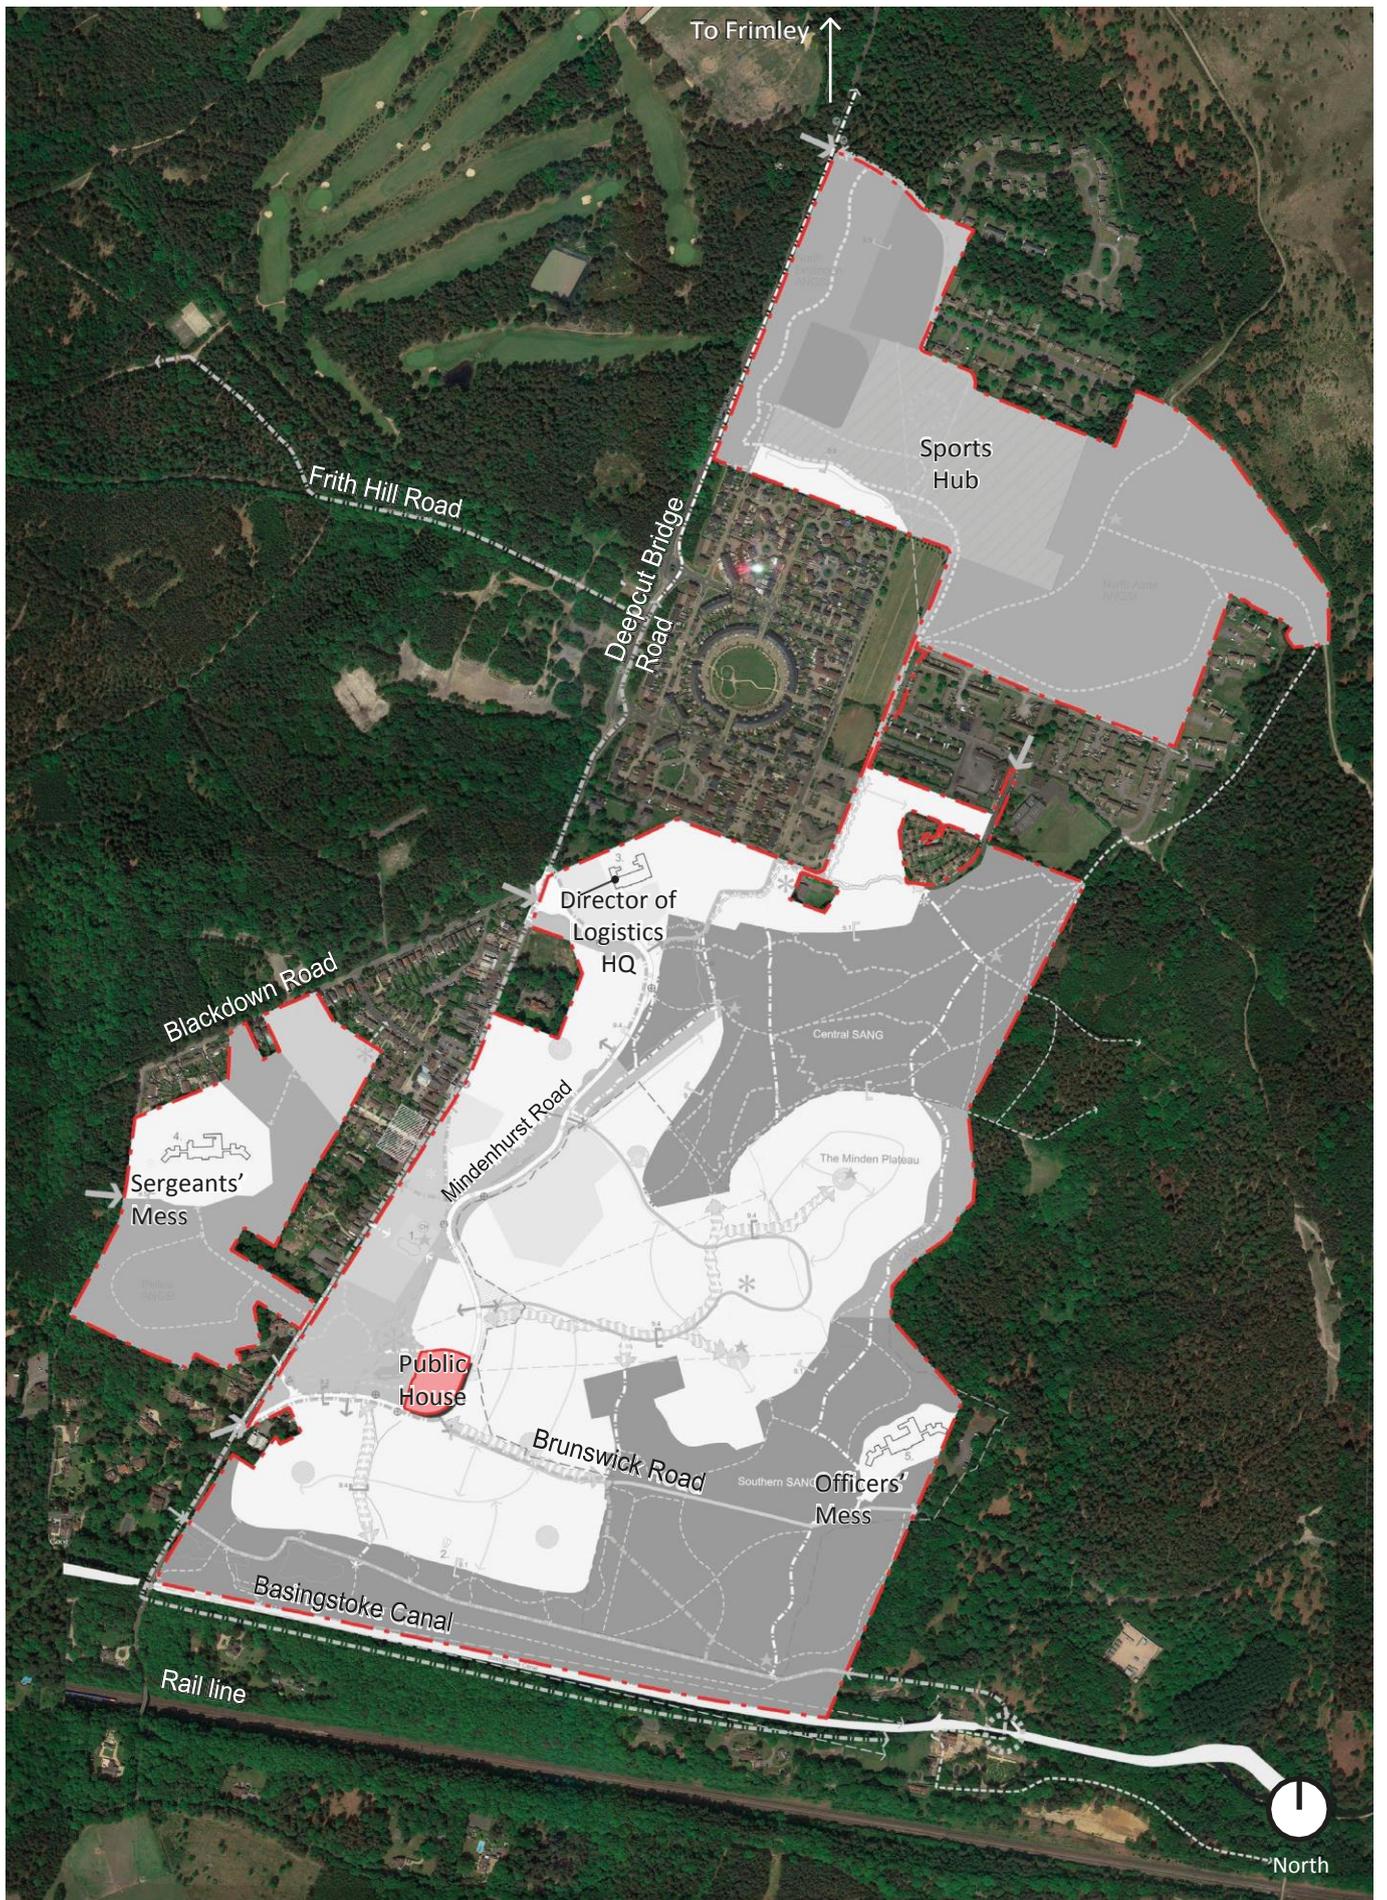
Plan of the site showing the Mindenhurst site boundary and the location of the Phase 3c Public House.
